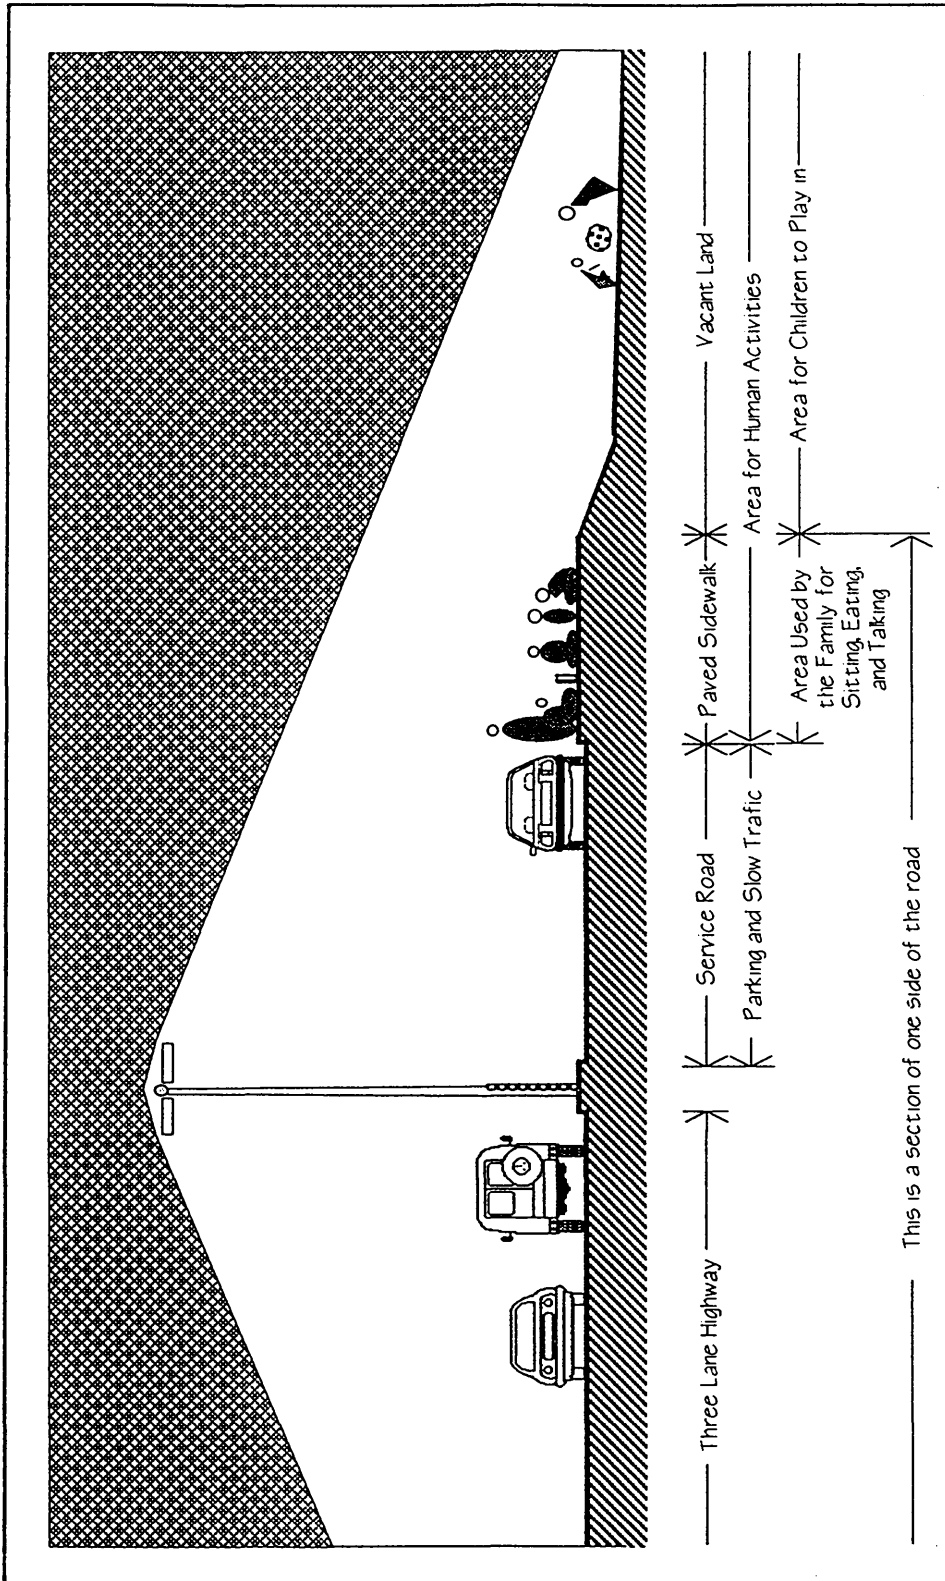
A section in a typical motor-way. People park their cars along the paved side of the service road and sit on the pavement where their children play in the open lands adjacent to the road.
